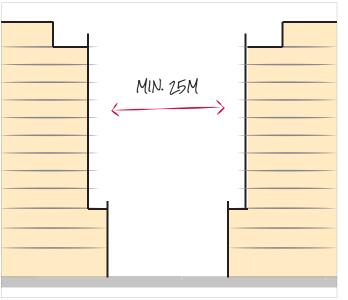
Provide separation distance between towers on the same site of 25m or greater (5.1.3 c).
